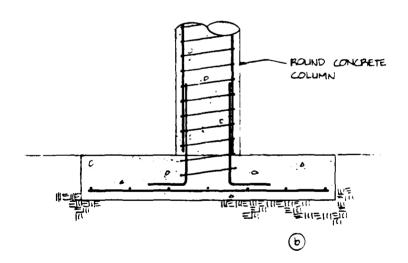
Reinforced Concrete Cast-in-Place Column Base Connections.
